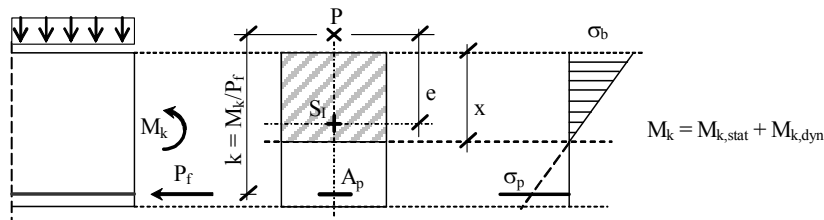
Prestressed, cracked section subjected to bending
